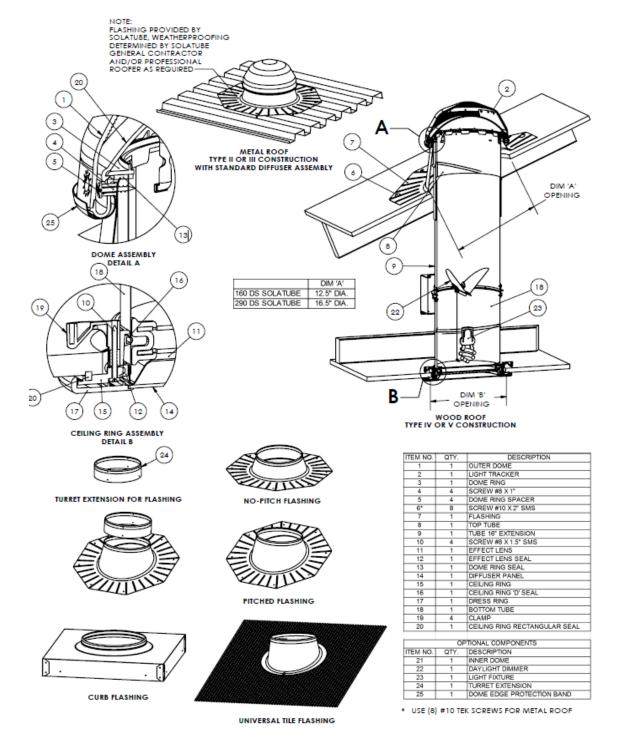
160 DS AND 290 DS SOLATUBE WITH DETAILS
